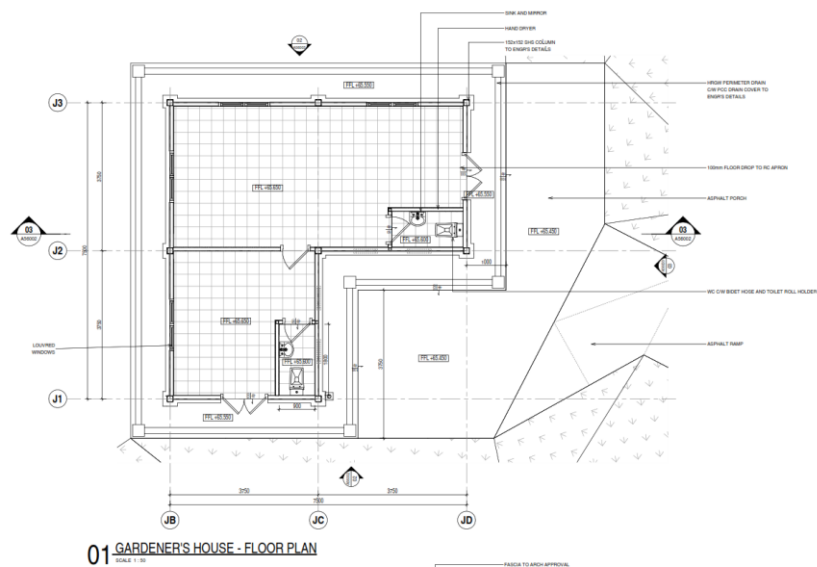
57 Carcosa Seri Negara Gardener's House Floor Plan Reference for 3D Model
